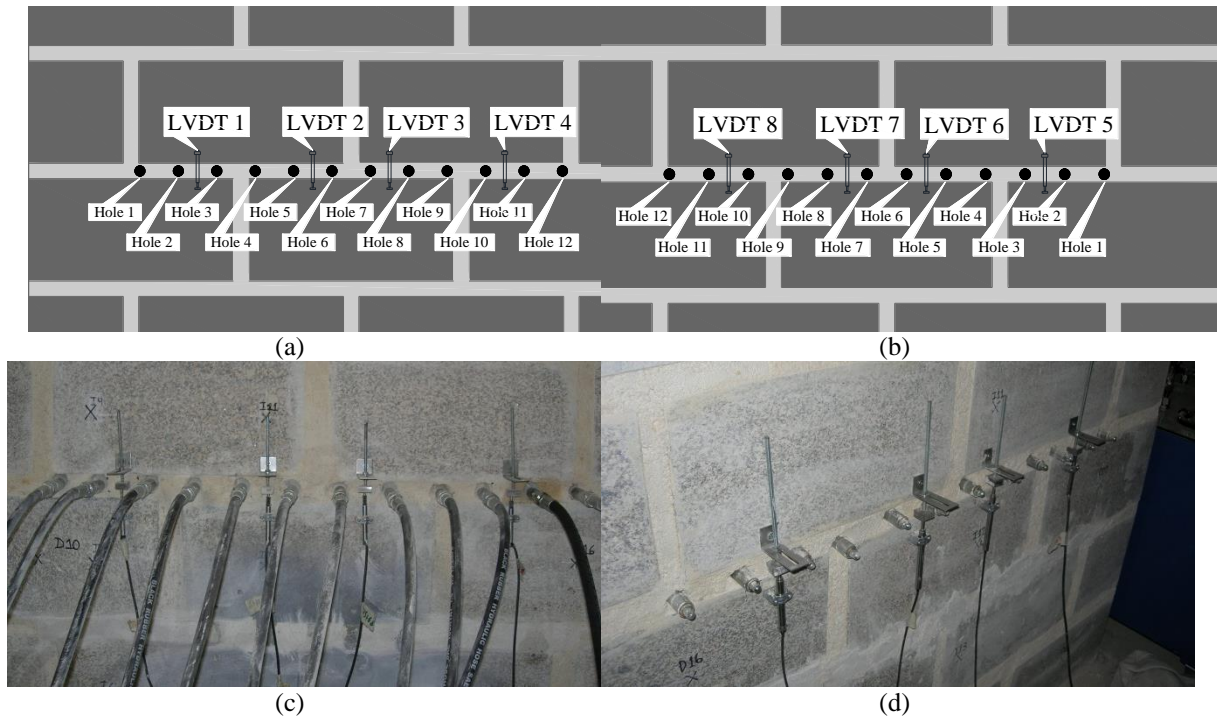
Holes and LVDT positions for the single tube-jack tests: (a) front of the wall; (b) back of the wall; (c) tube-jacks inserted in the front of the wall; and (d) tube-jack ends sticking out the back of the wall
